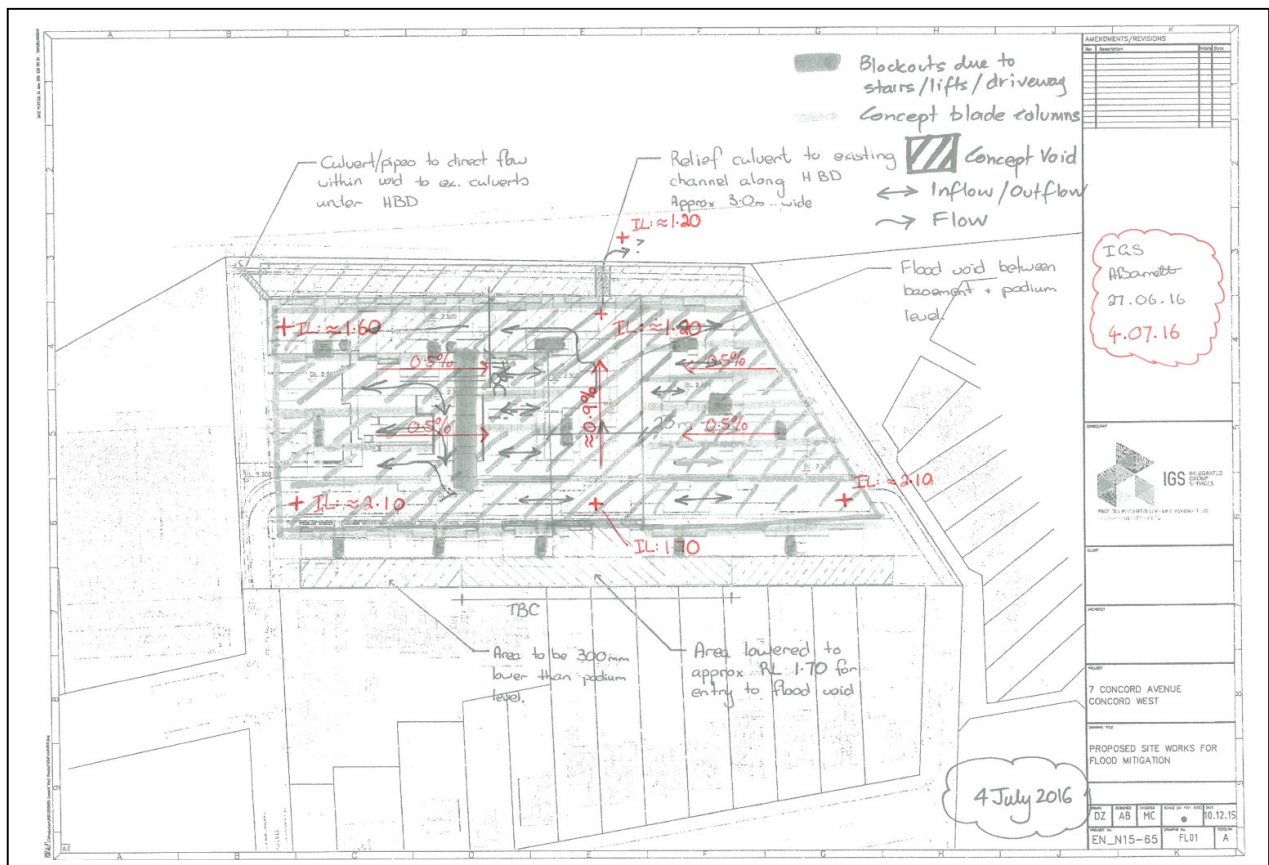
Scenario 3 (Full Floodway / Storage Void Under Entire Building Footprint)
